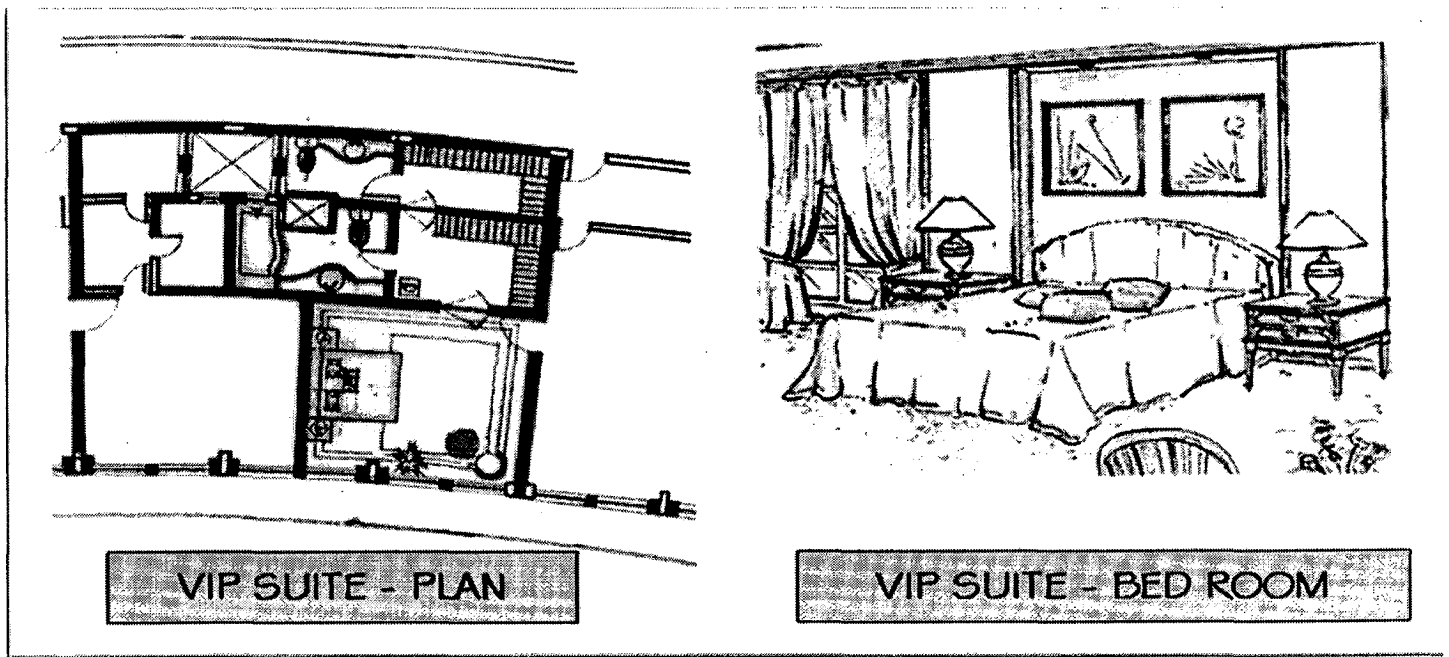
Sketches showing plan of VIP Suite and 3D of interior.
